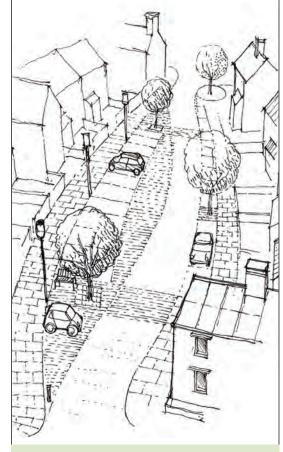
A parking street: indicative layout. Early discussions with the highway engineers would be required, to agree details for adoption.
